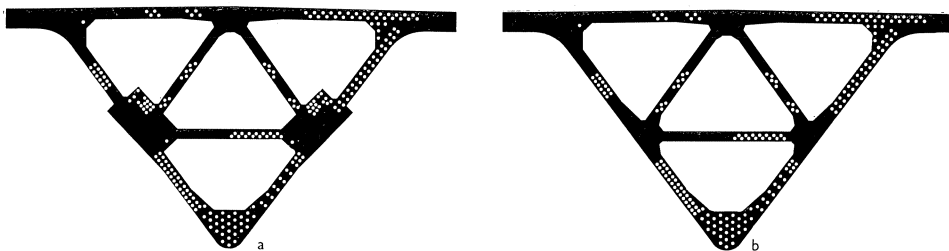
Location of the prestressing cables in the longitudinal direction:
